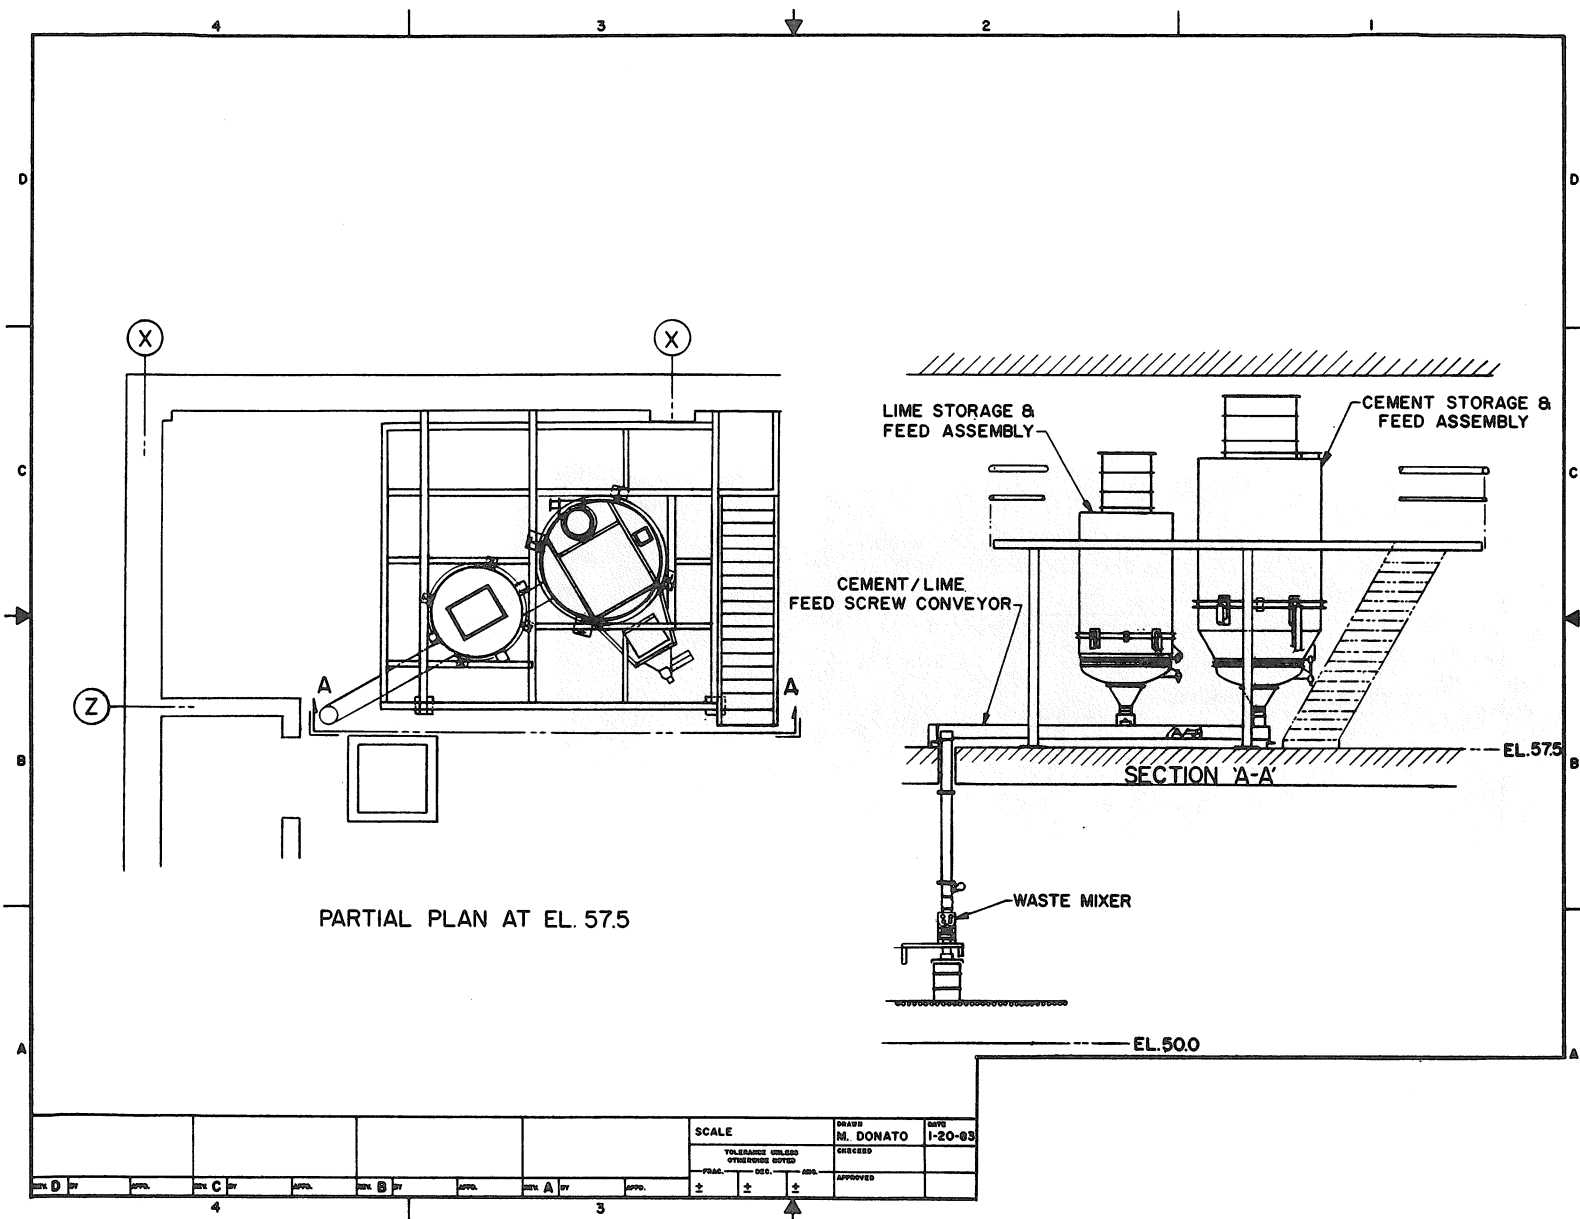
Installation of Cement & Lime Binder Storage and Feed Assemblies.
